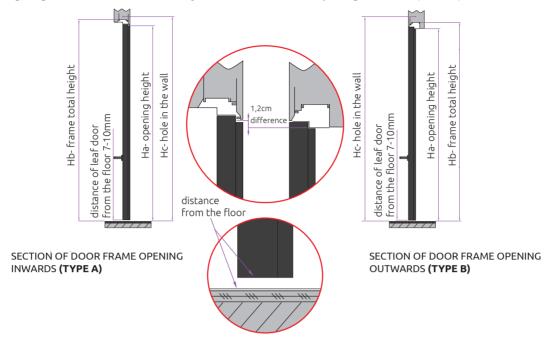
SECTION OF DOOR FRAME OPENING INWARDS (type A)
